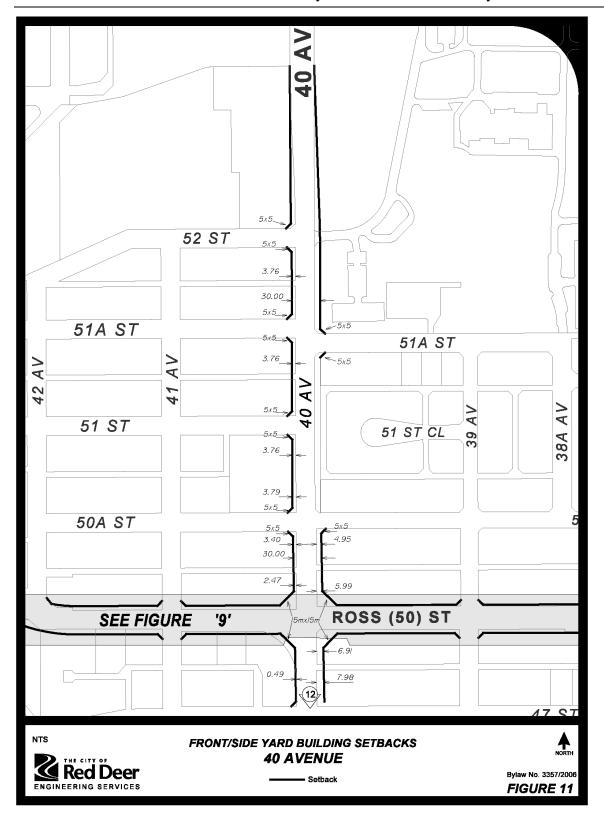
Front/Side Yard Building Setbacks 40 Avenue
